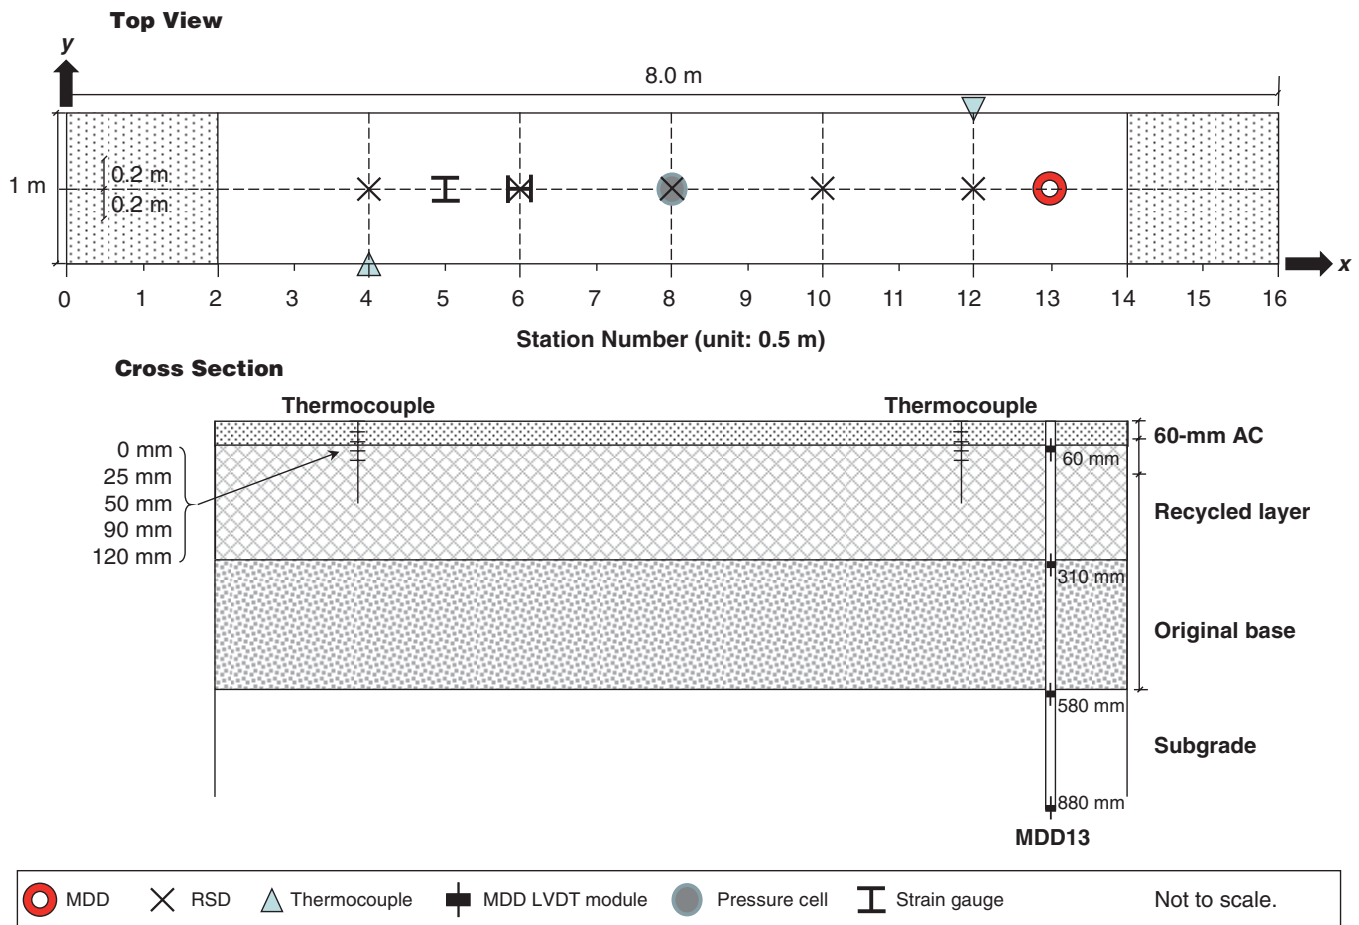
Test section layout (AC = asphalt concrete; LVDT = linear variable differential transformer).
